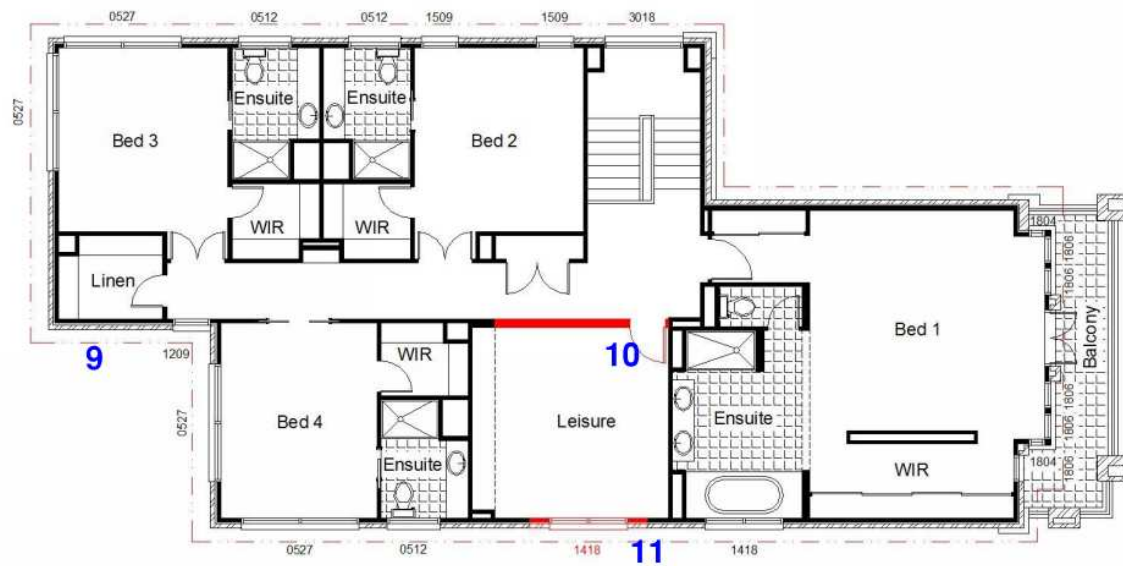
Redesigned first floor plan for Dwelling 12 in Adelaide, Brisbane, Canberra, Hobart and Melbourne.
